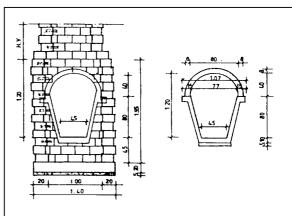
Protection of shafts with brick, masonry and gallery section with concrete (all section)
